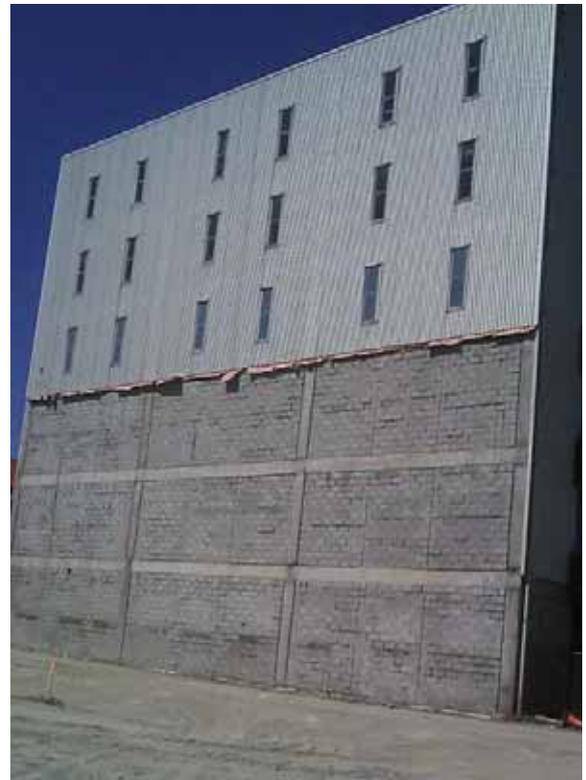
Photograph of the west wall after demolition of the building to the west, showing the block wall for the three lowest levels
